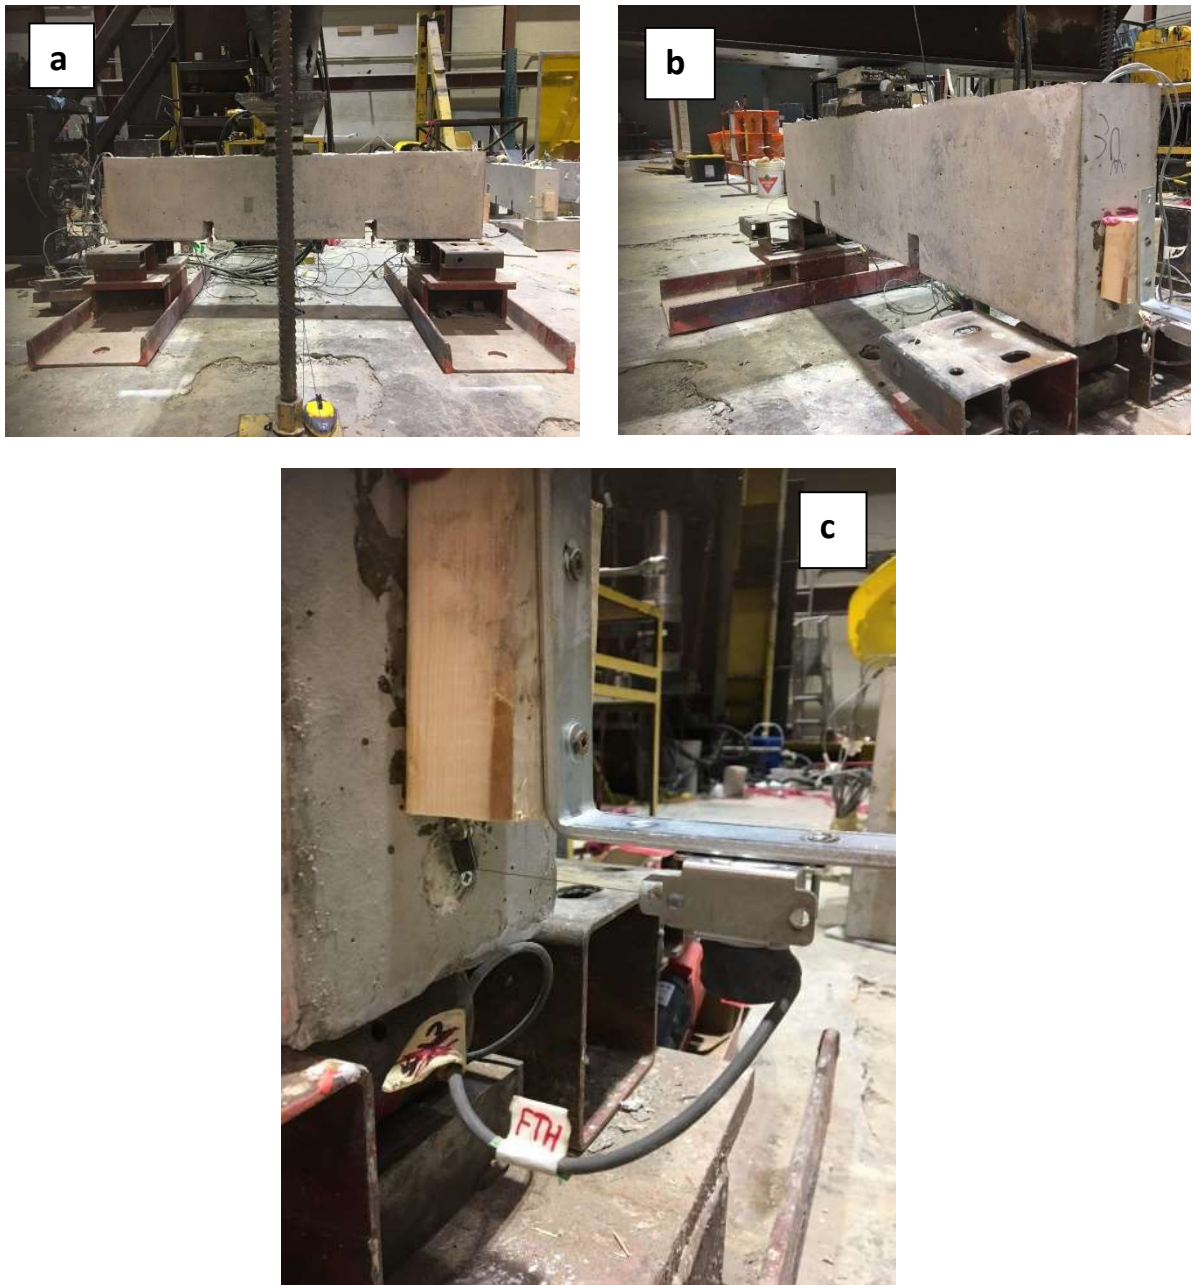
Beam Testing: (a and b) Beam Test Setup, (c) LVDT Installation
